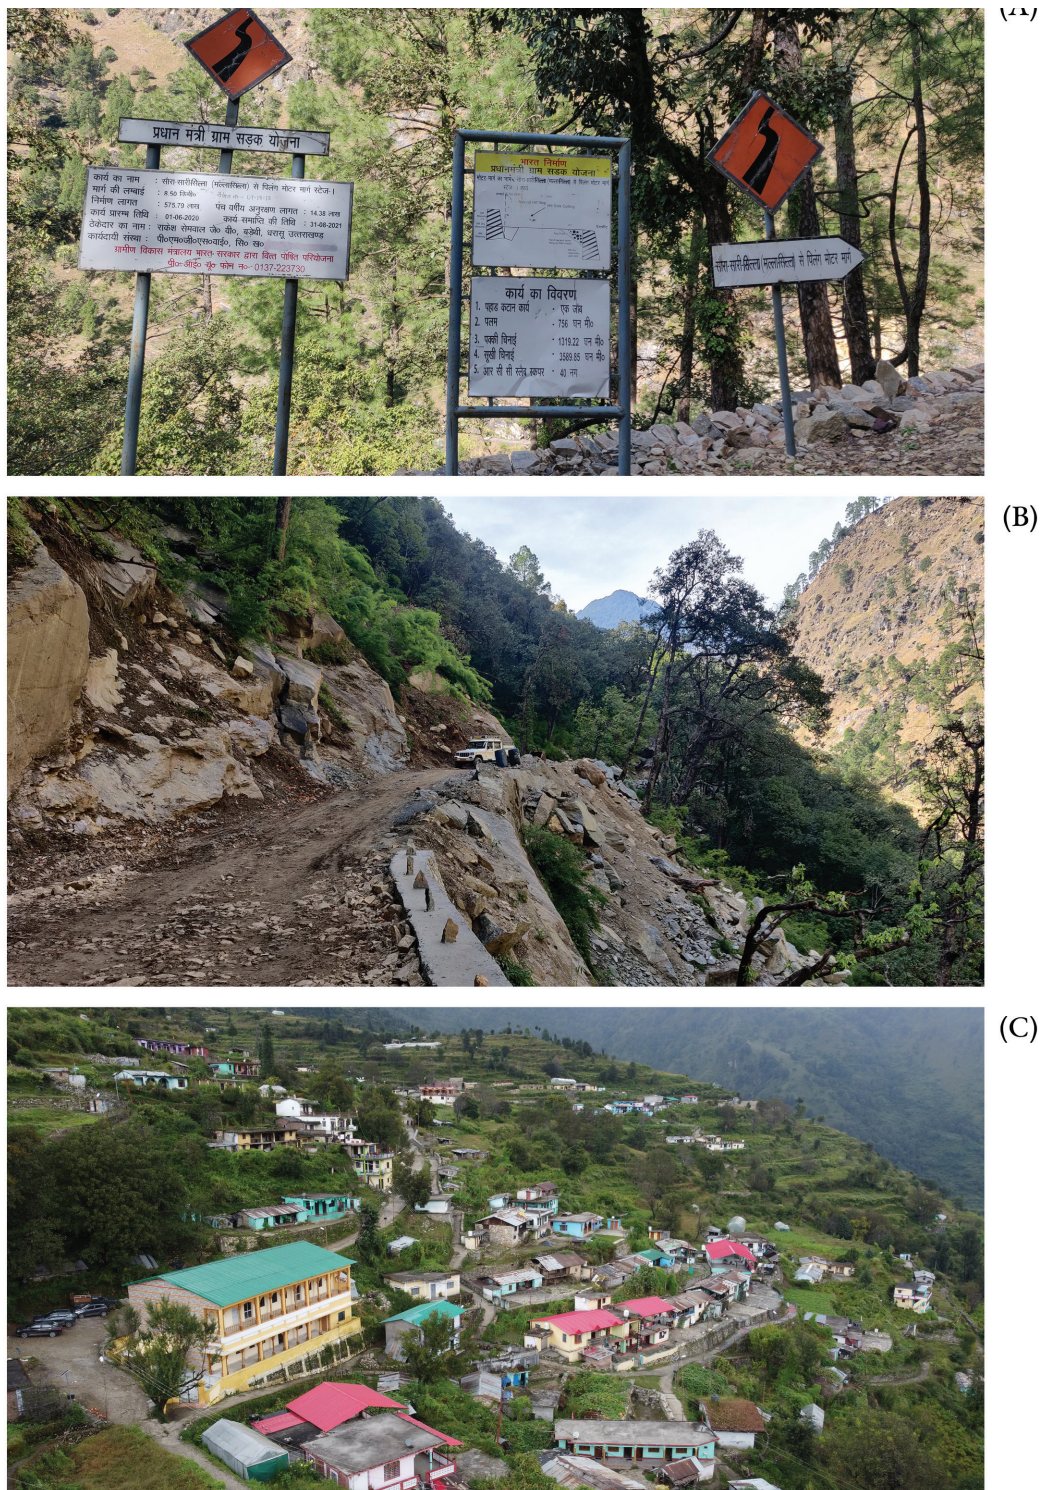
Imposition of infrastructure on the contemporary landscape. (A) Road project signage describes engineered details such as road length, details of slope cutting, excavation (November 2022); (B) The blasting and cutting of the mountains for the new road results in a fragmented forest (November 2022); (C) Raithal continues to expand into its agroforestry lands since the 1991 earthquake and influx of tourism (October 2021). Photographs: Manna.
